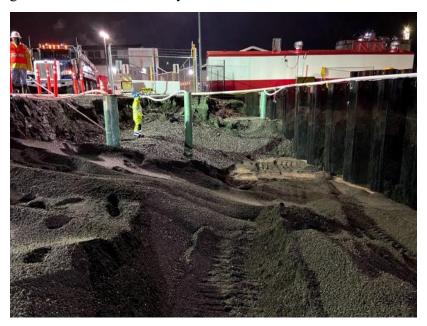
12/30/2020: Northwest facing view of excavation progress and dewatering header pipe from approximate location cell I-2.
